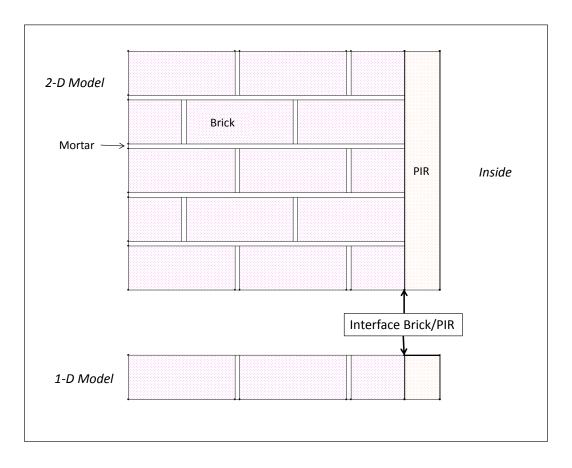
1-D and 2-D models with PIR internal wall insulation
